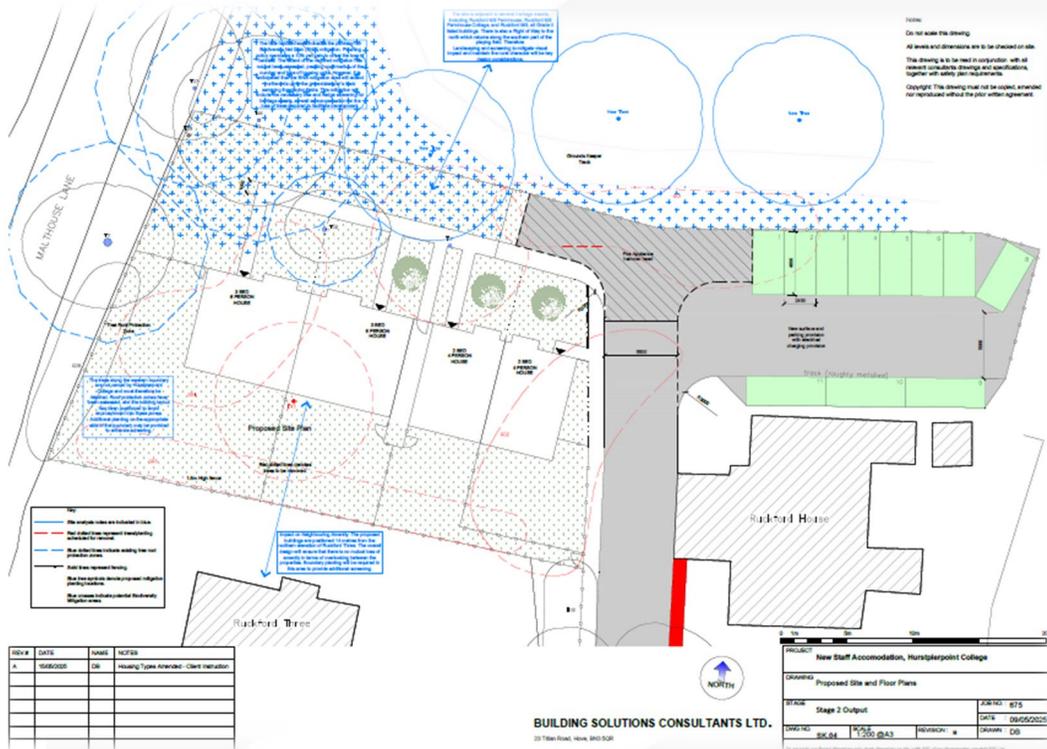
Proposed Site and Floor Plans, Drawing No. SK.04 (Building Solutions Consultants Ltd)
